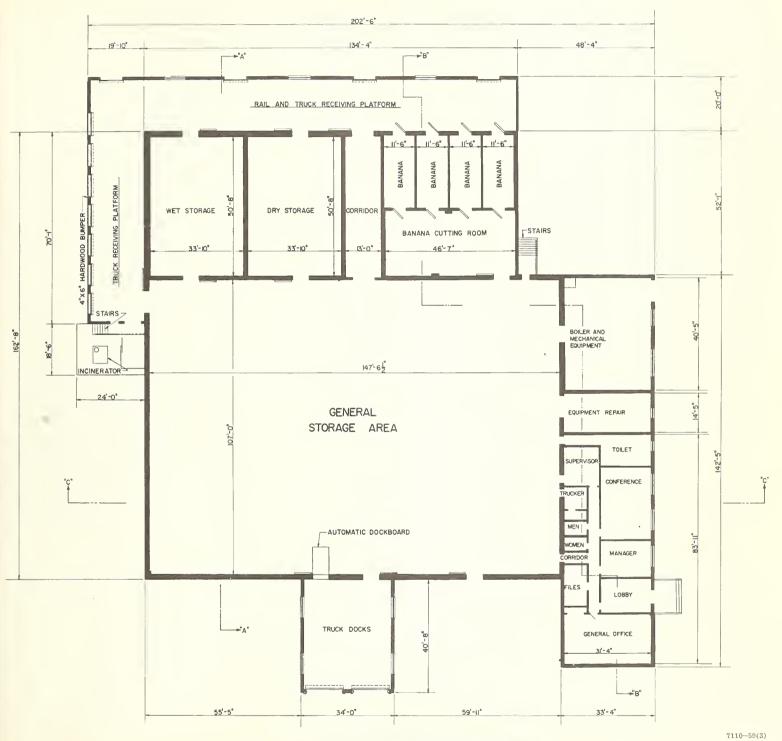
Floor plan, Minneapolis-St. Paul, Minn.
